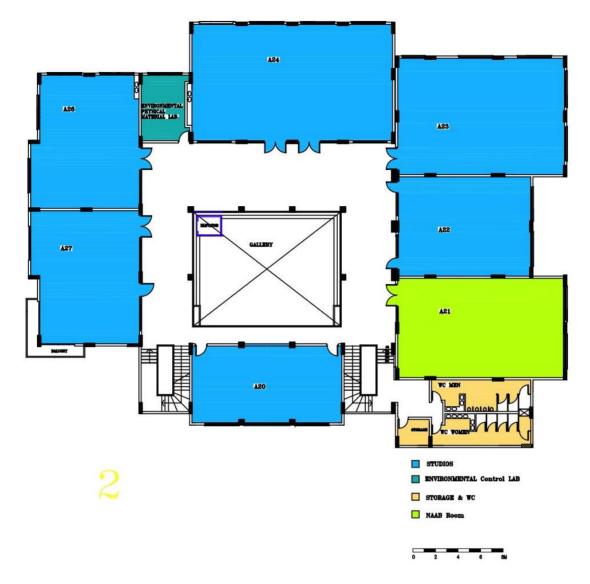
Second Floor Plan of the Colored Building
